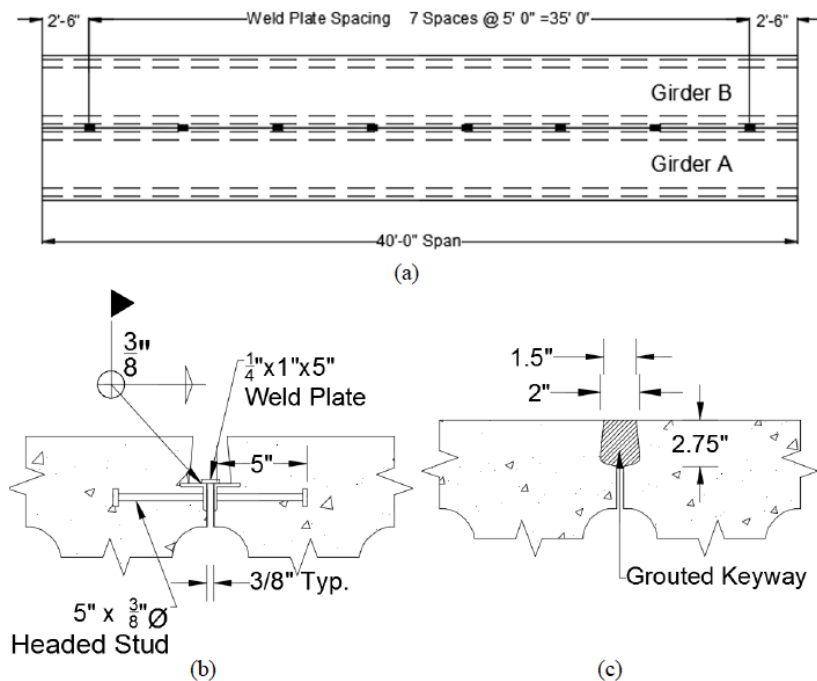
Current Double-Tee Bridge Longitudinal Joint Detailing (Konrad, 2014)
